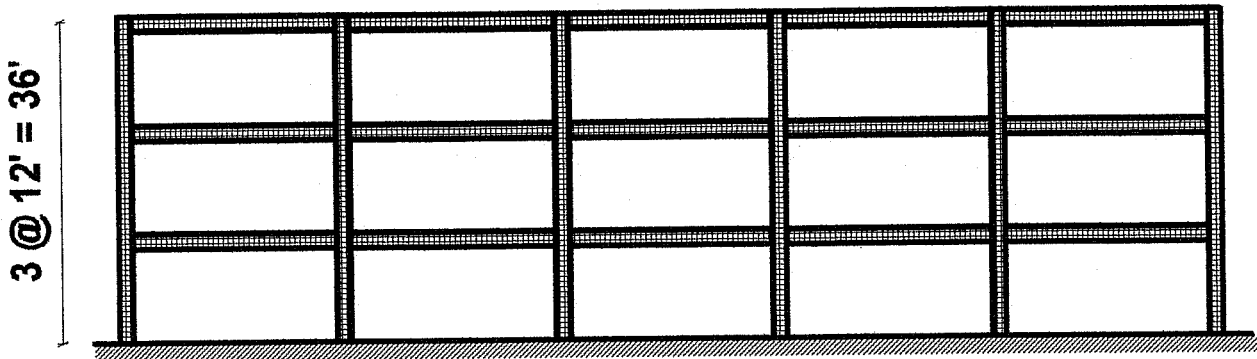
Elevation in the longitudinal direction of the three-story building.
